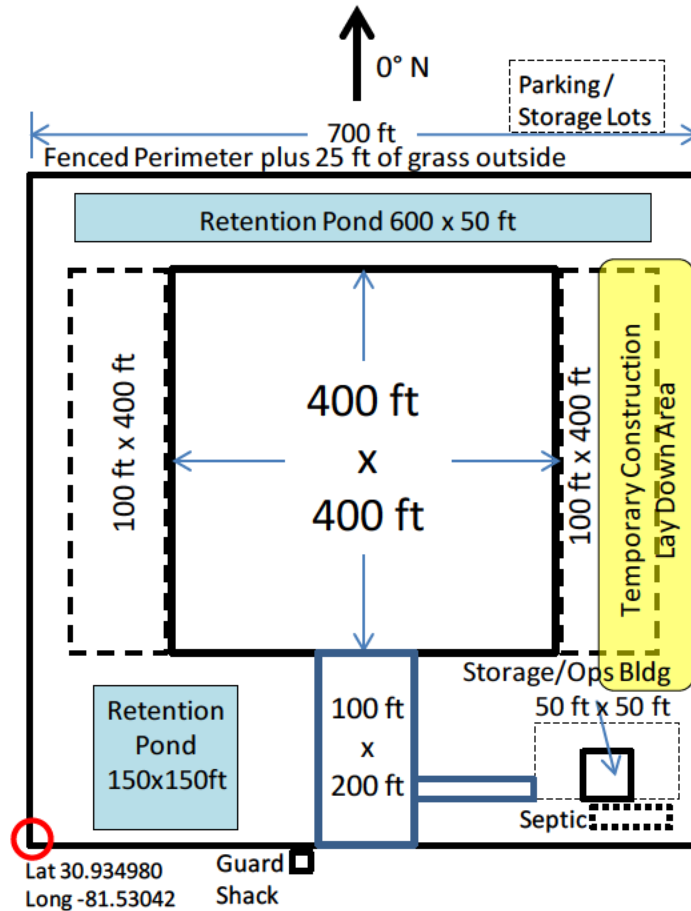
Proposed Mission Preparation Area Site Plan – Overhead Schematic
